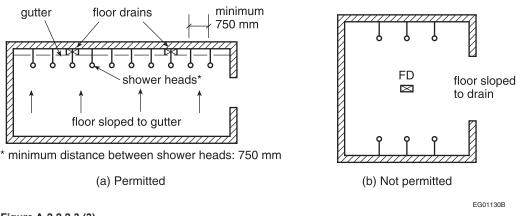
(3) Shower Drainage (Plan View)
